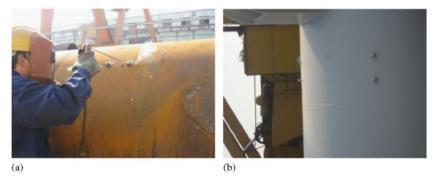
Sensor fixers for installing surface-type strain gauges: (a) welding of sensor fixers at workshop and (b) sensor fixers on erected column.
